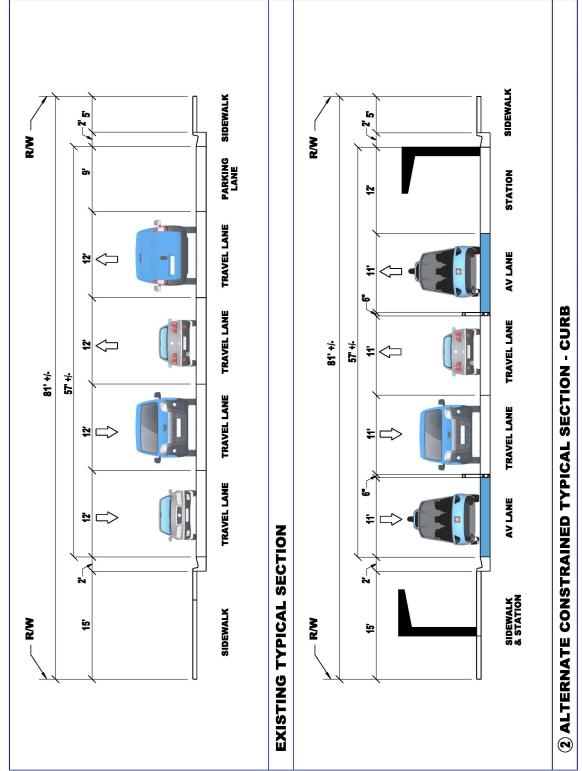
West Corridor Existing and Alternate Constrained Typical Section with Curbside Station - Park
